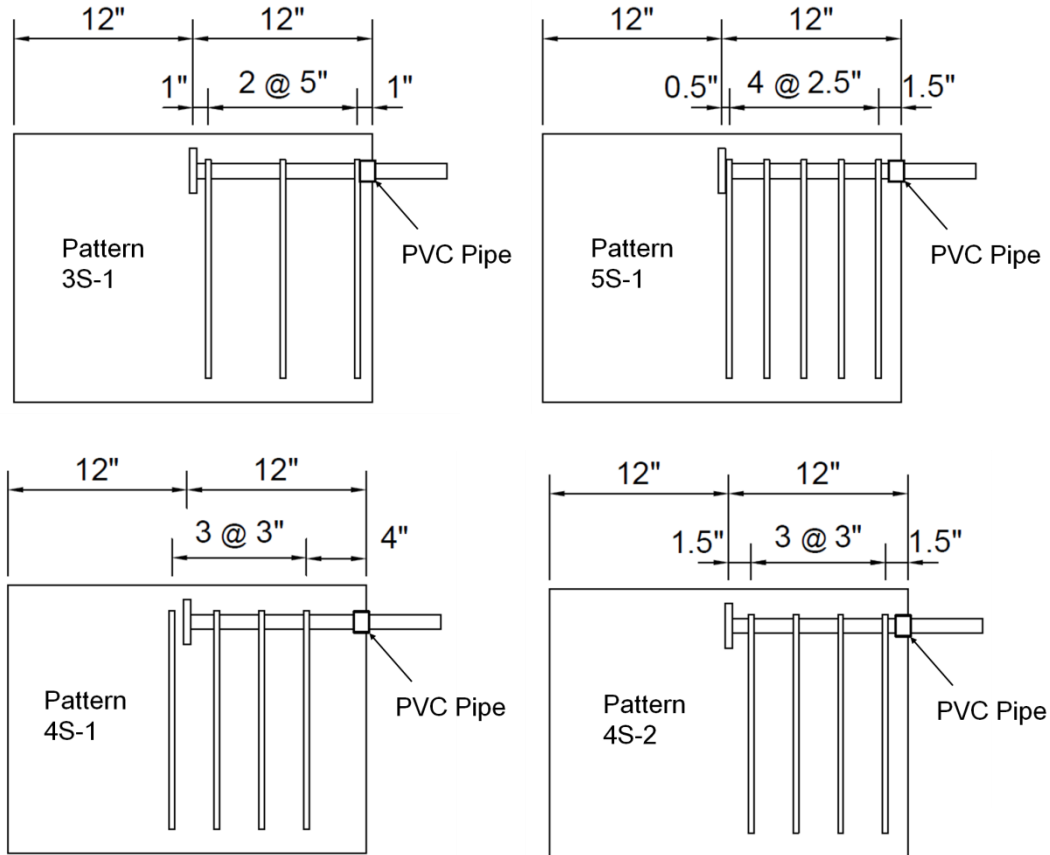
Stirrup configurations for beam-end specimens [figure after Wright and McCabe (1997)]
